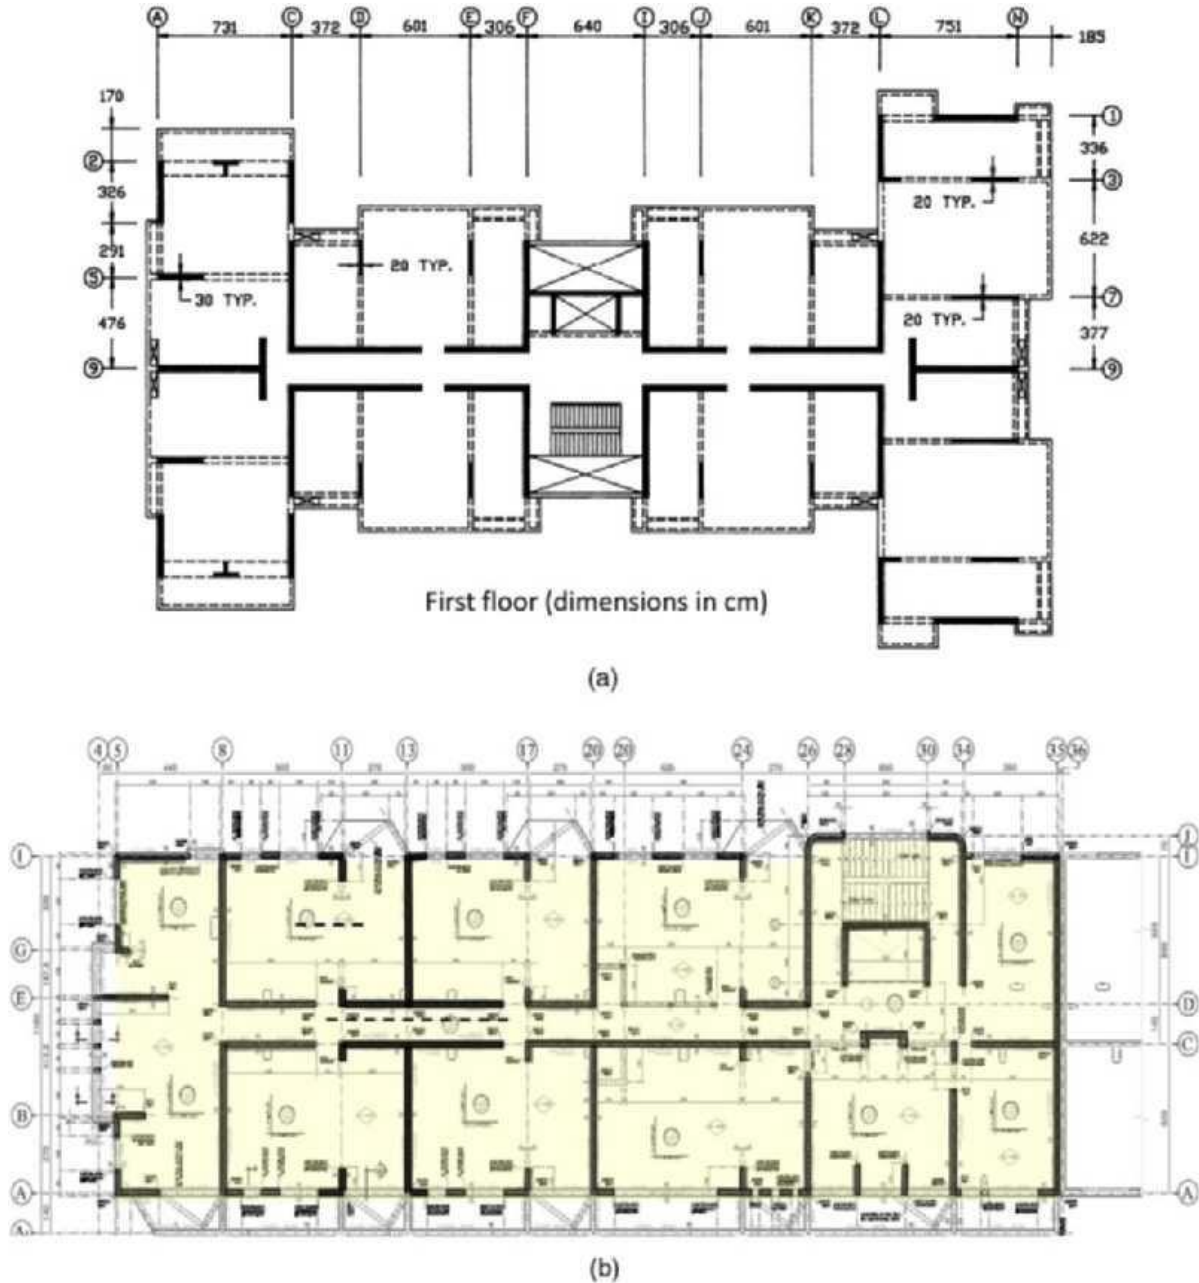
(a) Festival Building in Viña Del Mar (1978 construction). (b) Alto Río Building in Concepción (2007 construction).
